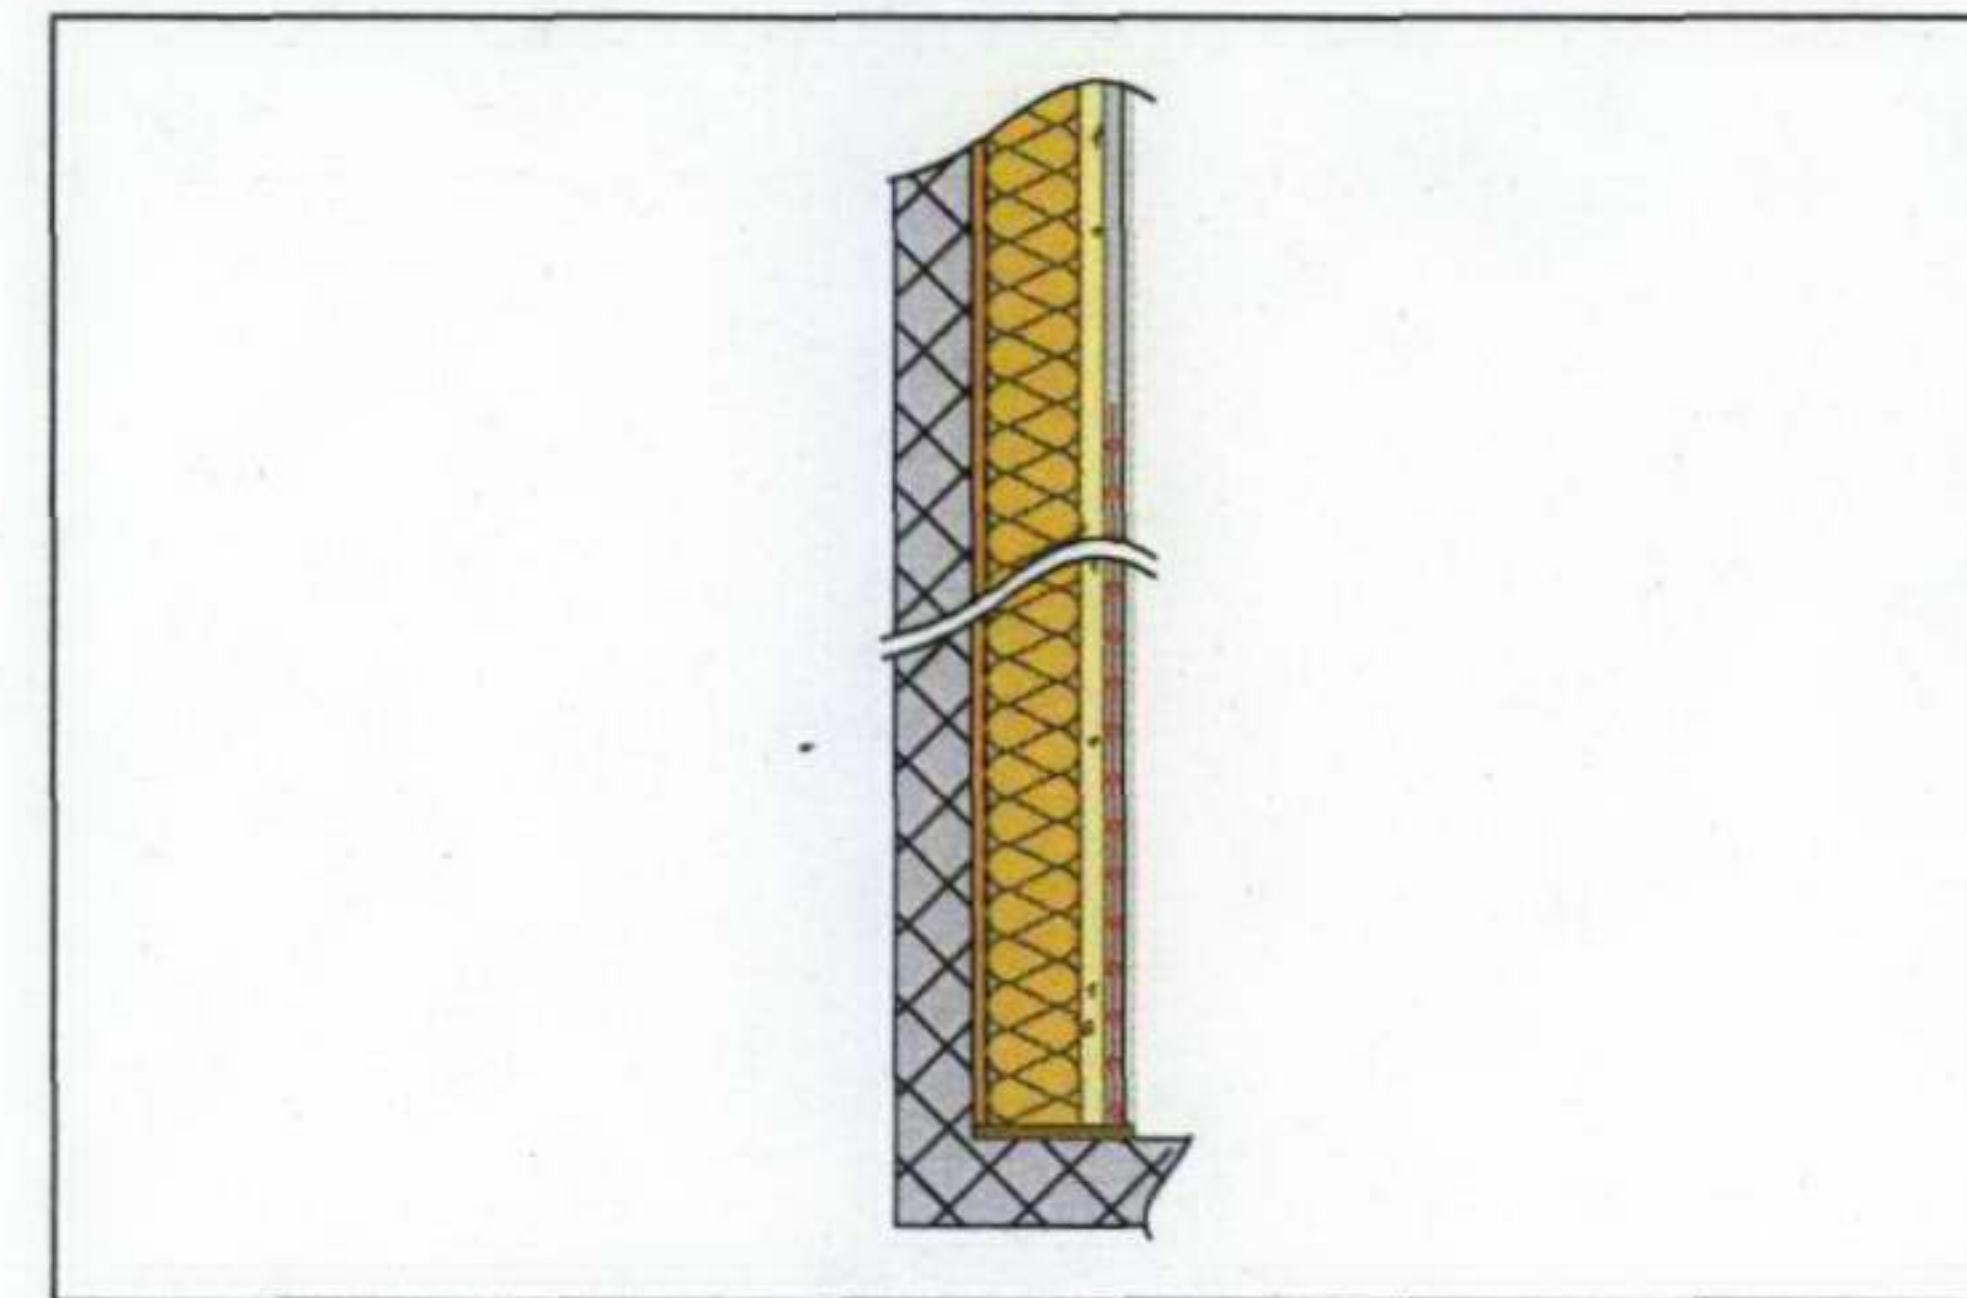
Wall construction with reinforcement material (see drawing Z023)
